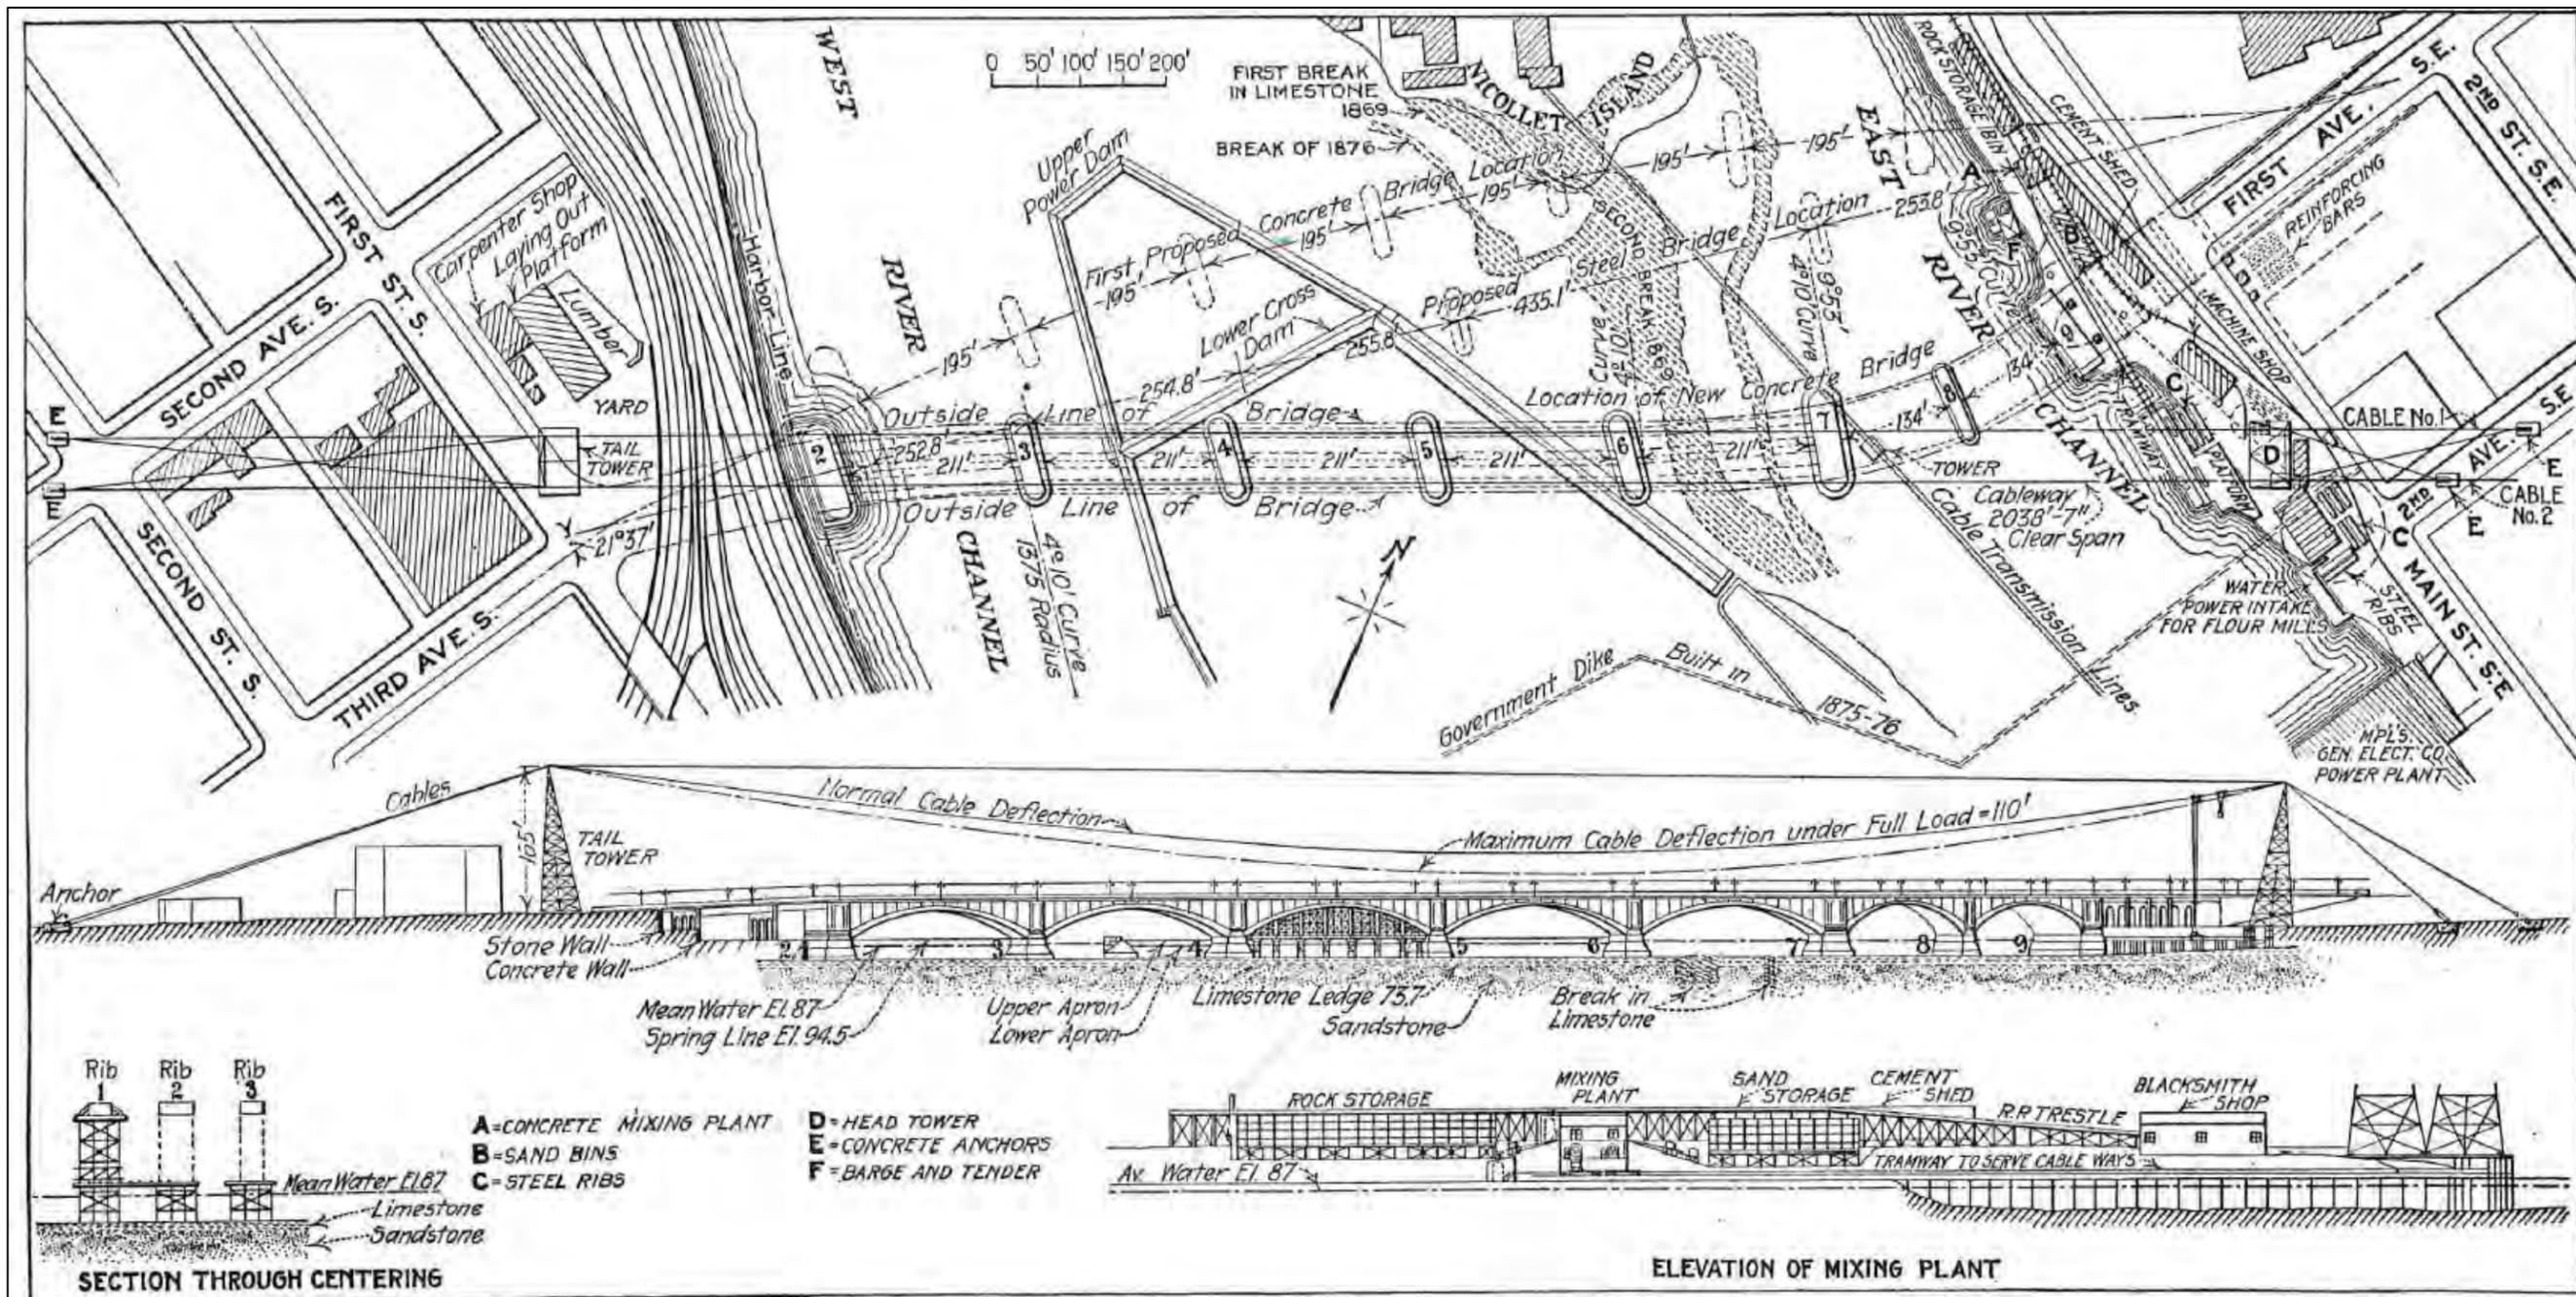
PLAN AND ELEVATION OF THE THIRD AVE. REINFORCED-CONCRETE ARCH BRIDGE OVER THE MISSISSIPPI RIVER AT MINNEAPOLIS, MINN.
